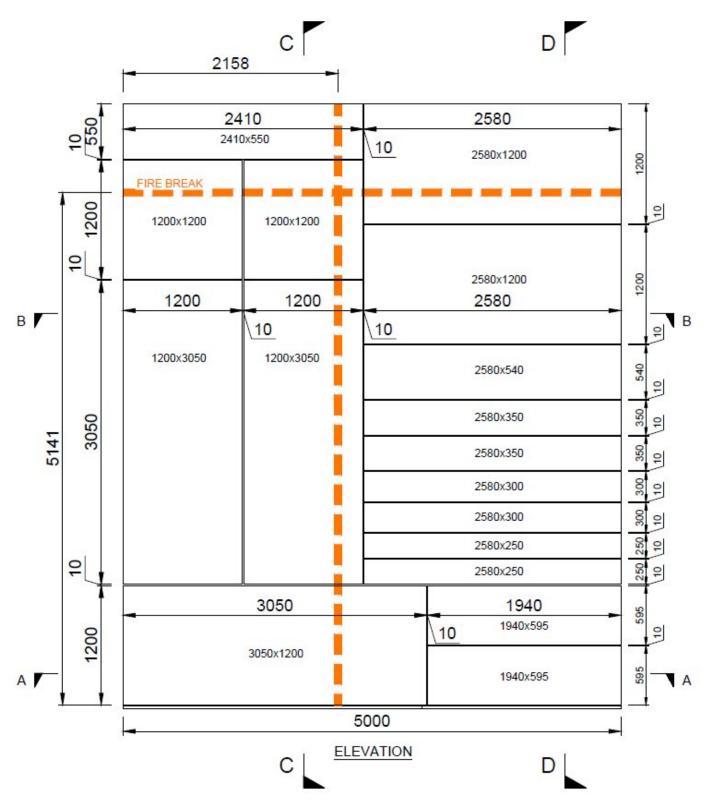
Elevation of cladding test sample showing location of cavity barriers
